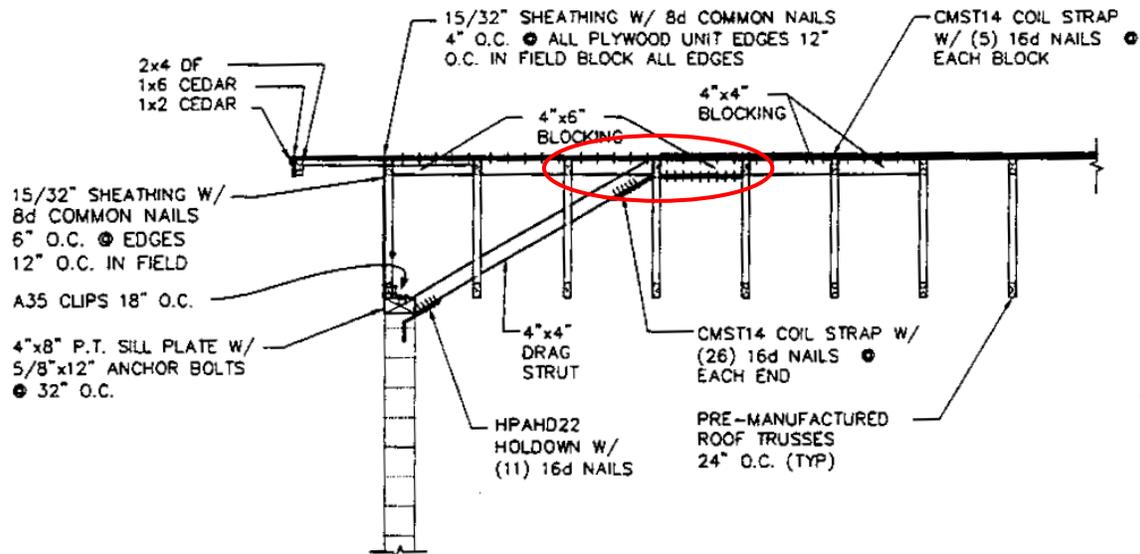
Inadequate Connection between Blocking and Roof Truss
